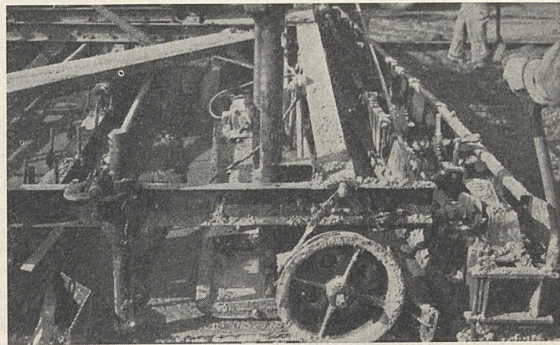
CONCRETE FINISHING MACHINE, SHOWING PAN-TYPE VIBRATOR MOUNTED BETWEEN THE TWO SCREEDS.
